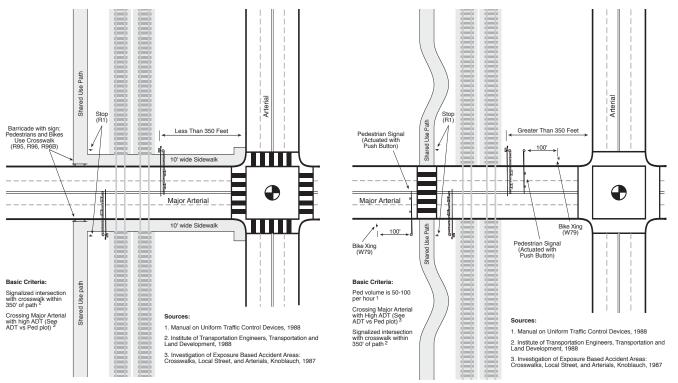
Roadway crossing type 1 (reroute to nearest intersection)
